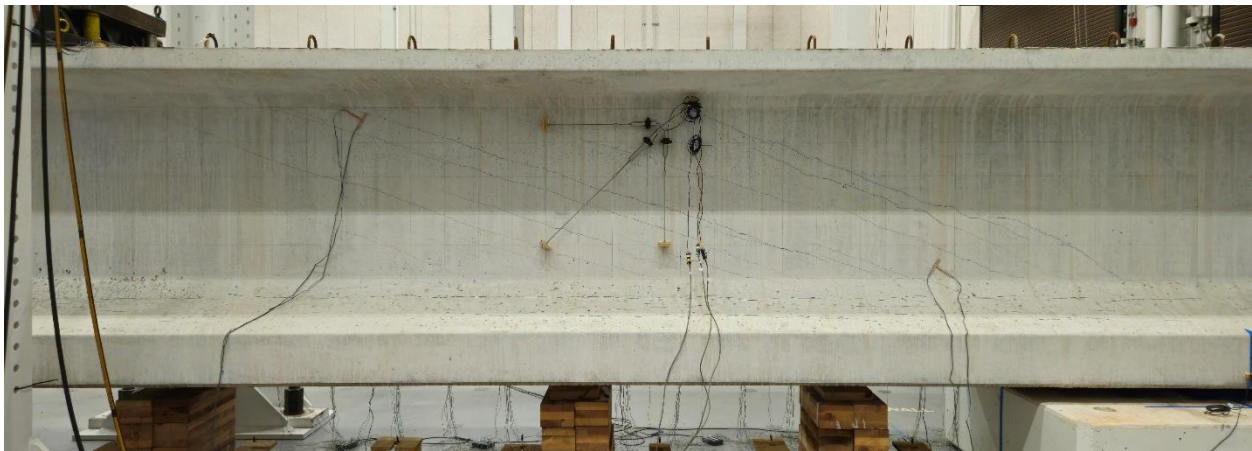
East side of G9 girder at cracking load.
